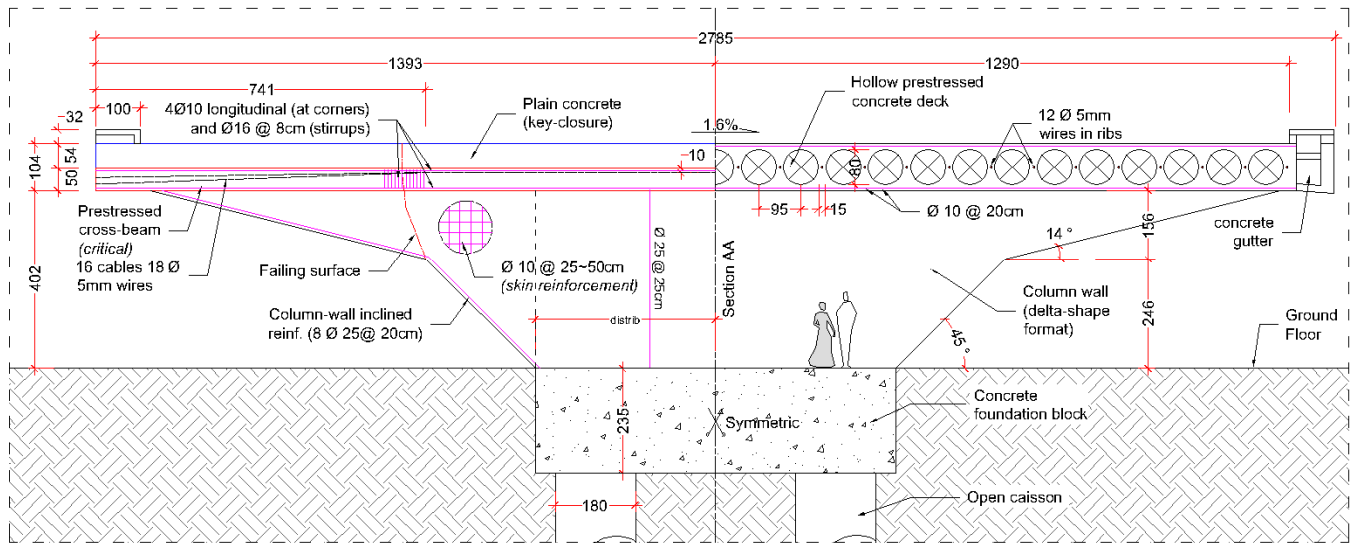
Plan view of the column wall in cm. Left: details retrieved through site investigations (indicating reinforcing steel in magenta and plain concrete in blue). Right: hollow prestressed concrete deck; units are in cm (with dimension lines in red). $\varnothing$ = diameter of rebars; @ = spacing of centers.
